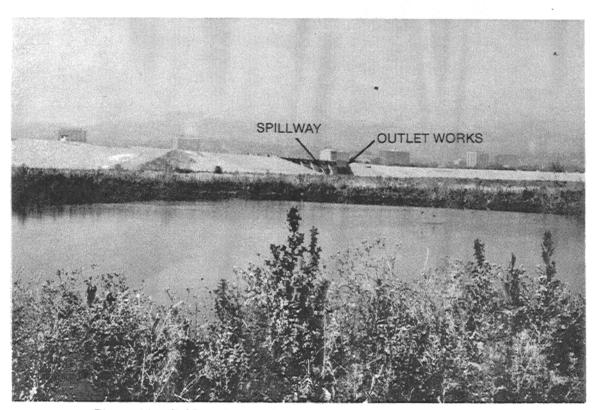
Wildlife Pond (view from within reservoir, looking downstream toward southeast).
